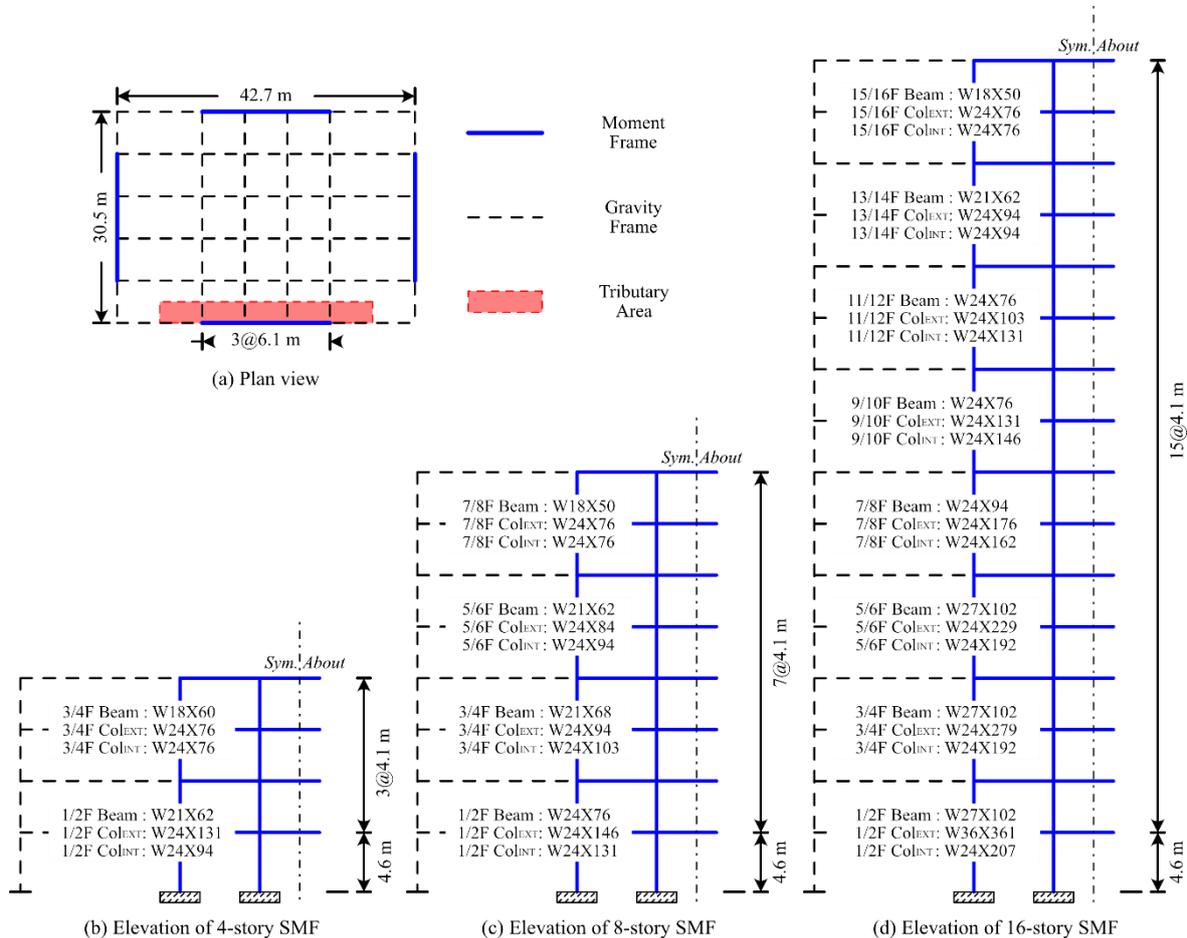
Plan, elevation, and designed section of 4-, 8-, and 16-story steel SMFs.
